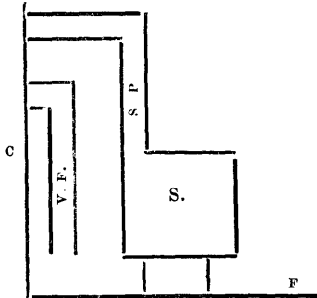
F., floor; S., stove; S. P., stove pipe; V. F., ventilating flue; C., chimney.
